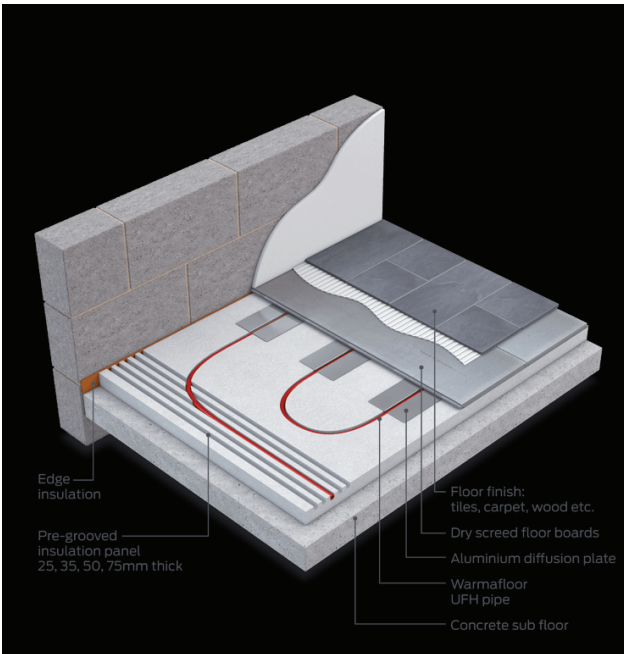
“Underfloor Heating and Cooling Systems.” by Warmafloor.
